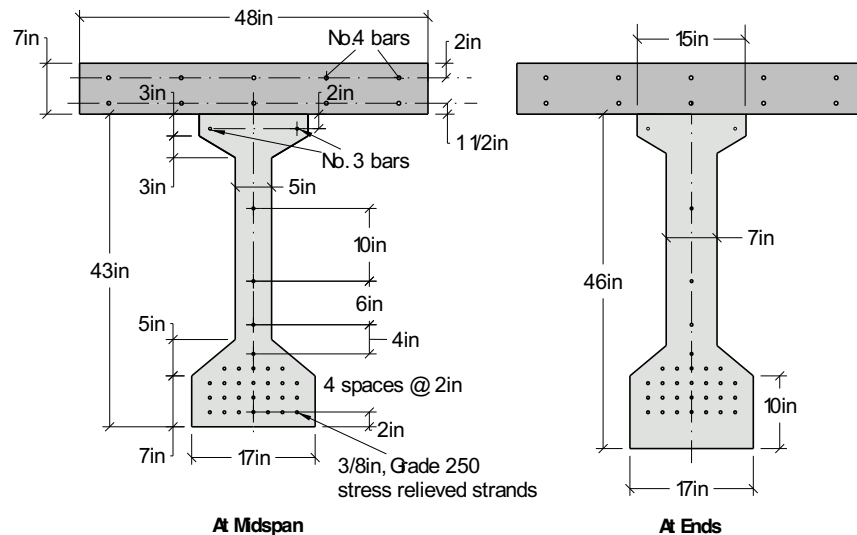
Cross-Section of Hampton Road Bridge-Tunnel Beams
